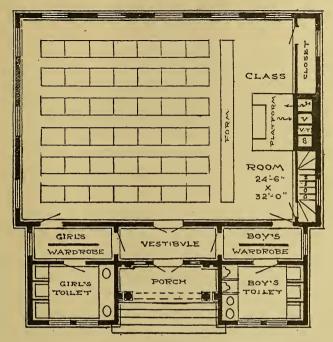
Floor Plan of Model Schoolhouse. With Fig. 8.
